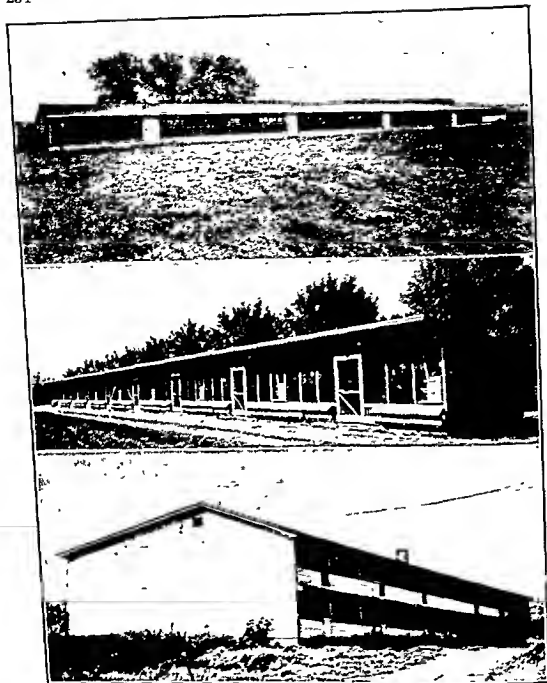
Top, an open-front 30- by 150-ft. laying house in southern Delaware, with a 20-ft. feed section at the far end. The house has a dirt floor. Rear openings provide summer ventilation. (O. A. Newton and Sons.) Center, a 1,000-hen capacity trap-nest house in California, with water, grit, oystershell, and green-feed troughs on the outside. (Dryden Poultry Breeding Farm.) Bottom, a two-story New Hampshire laying house 40 ft. wide. (New Hampshire Poultry Association Yearbook, 1943.)
